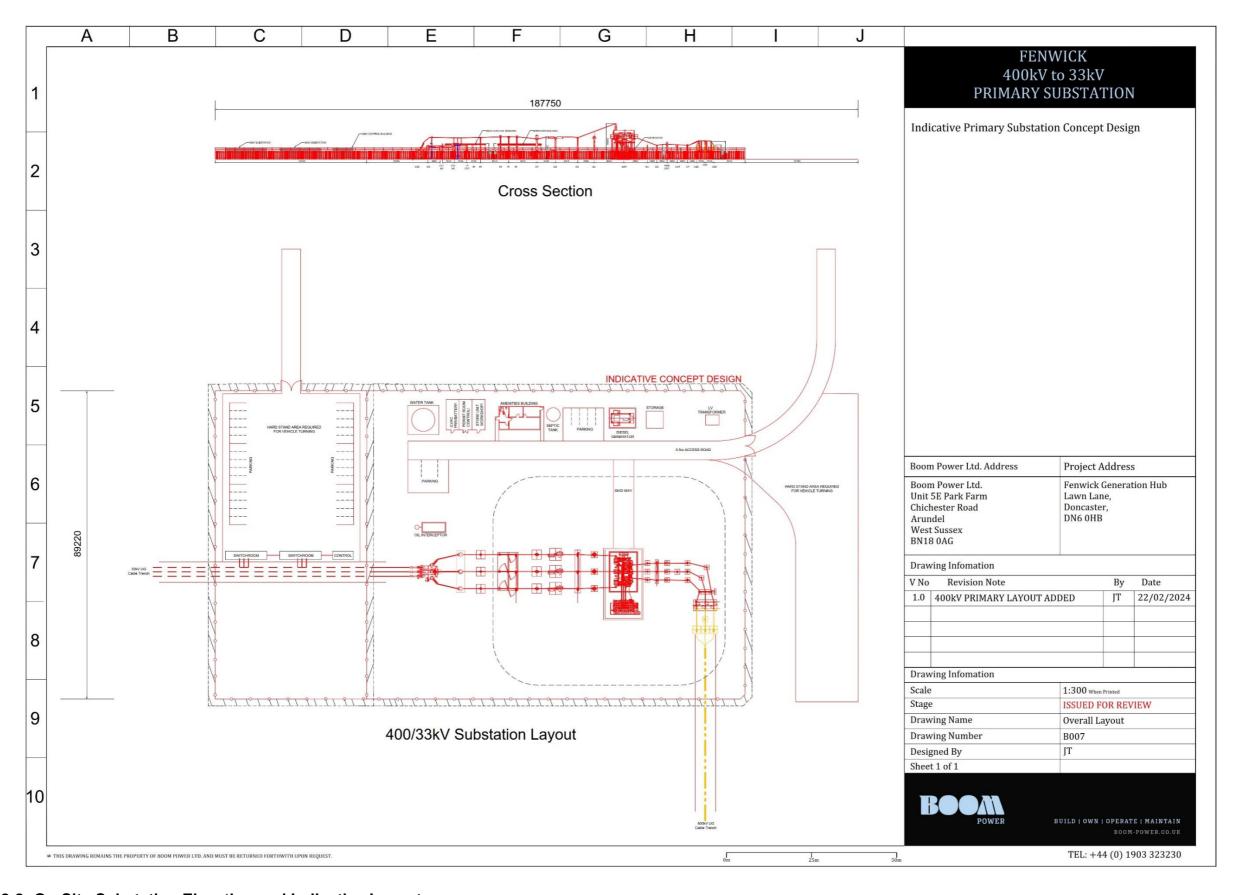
On-Site Substation Elevation and Indicative Layout
